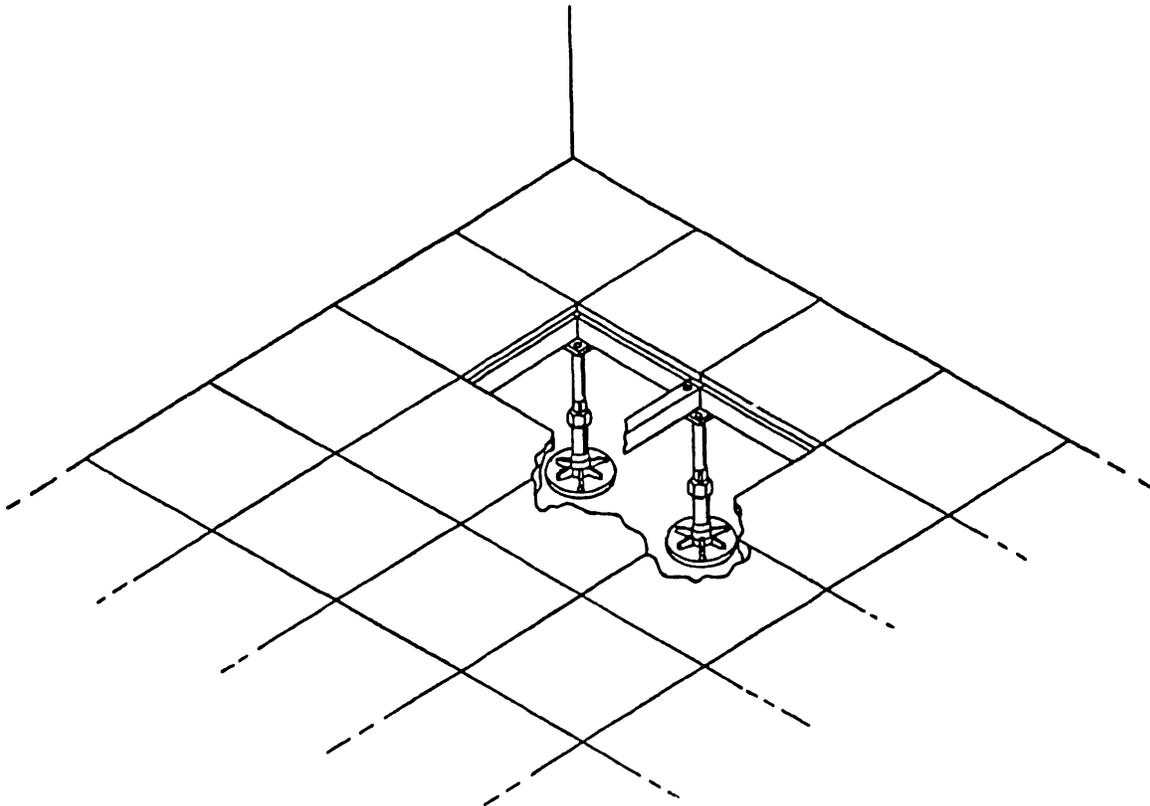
PEDESTAL-TYPE RAISED FLOORING
